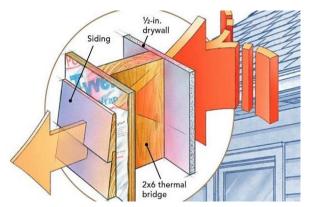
Thermal bridging of wall stud bay (Engineers forum)
